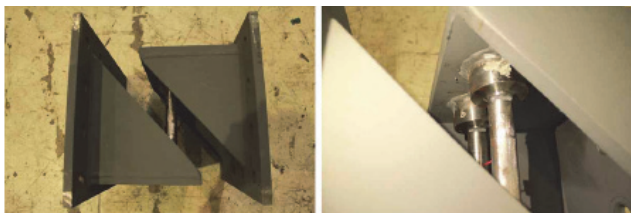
Failure shape of steel rod damper by Oh and Choi(2017)
